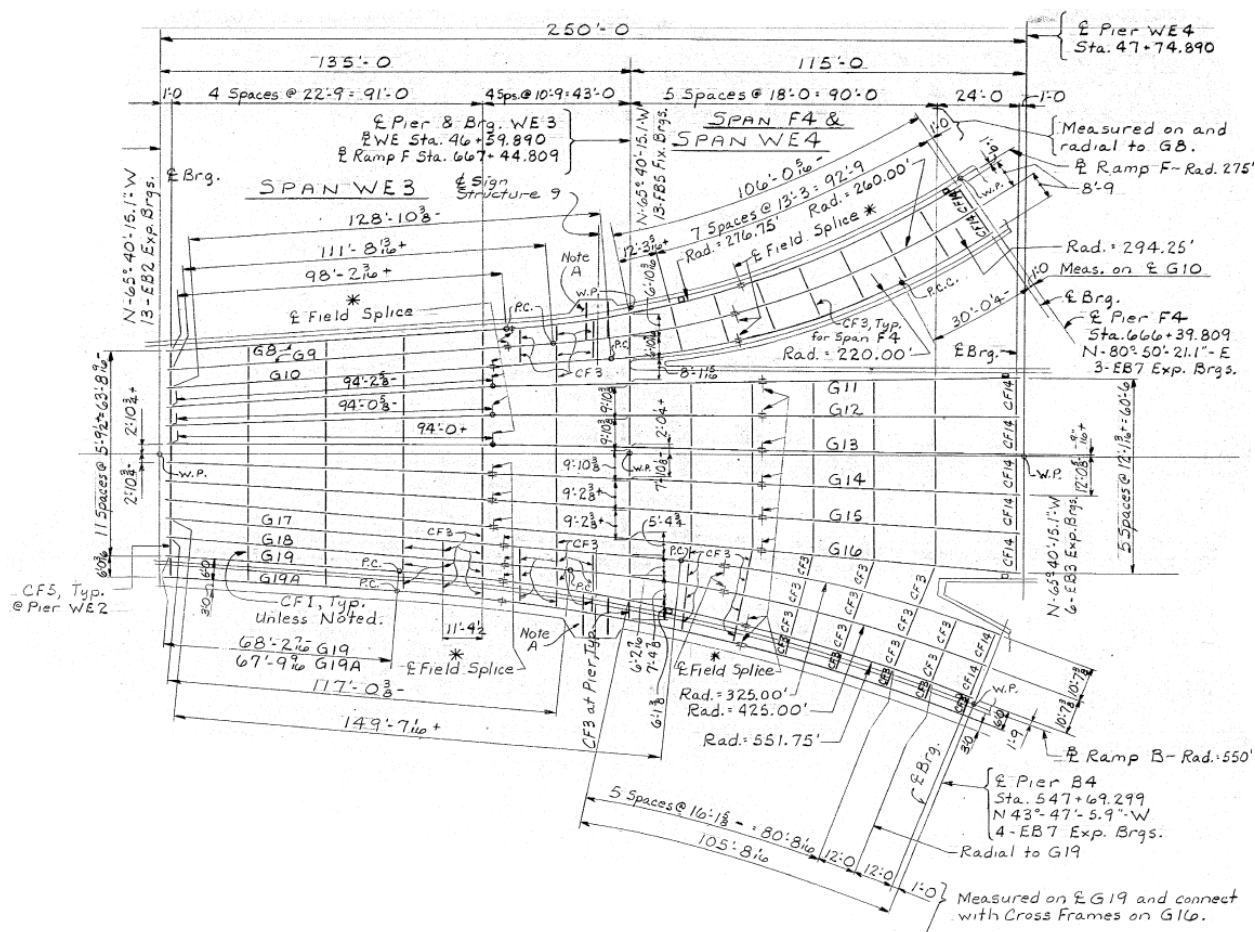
Example of a Ramp Structure with Atypical Geometry such as Splayed Girders, Variable Deck Width, and Horizontal Curvature
